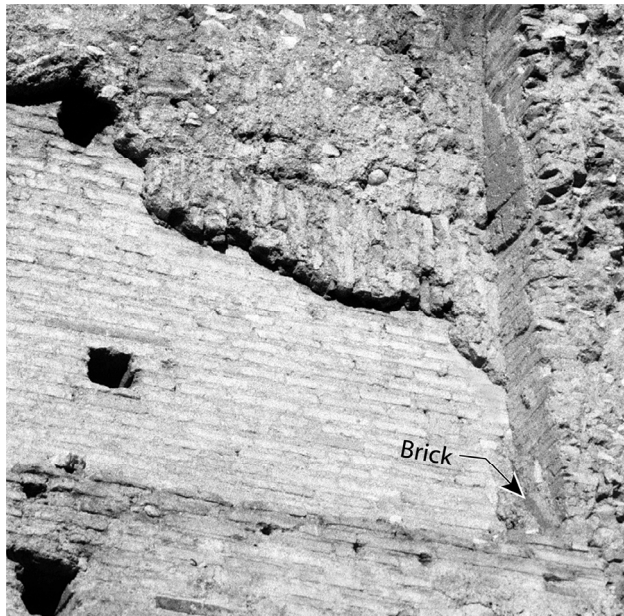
Argos, Greece. Detail of remains of brick vault in main hall.
